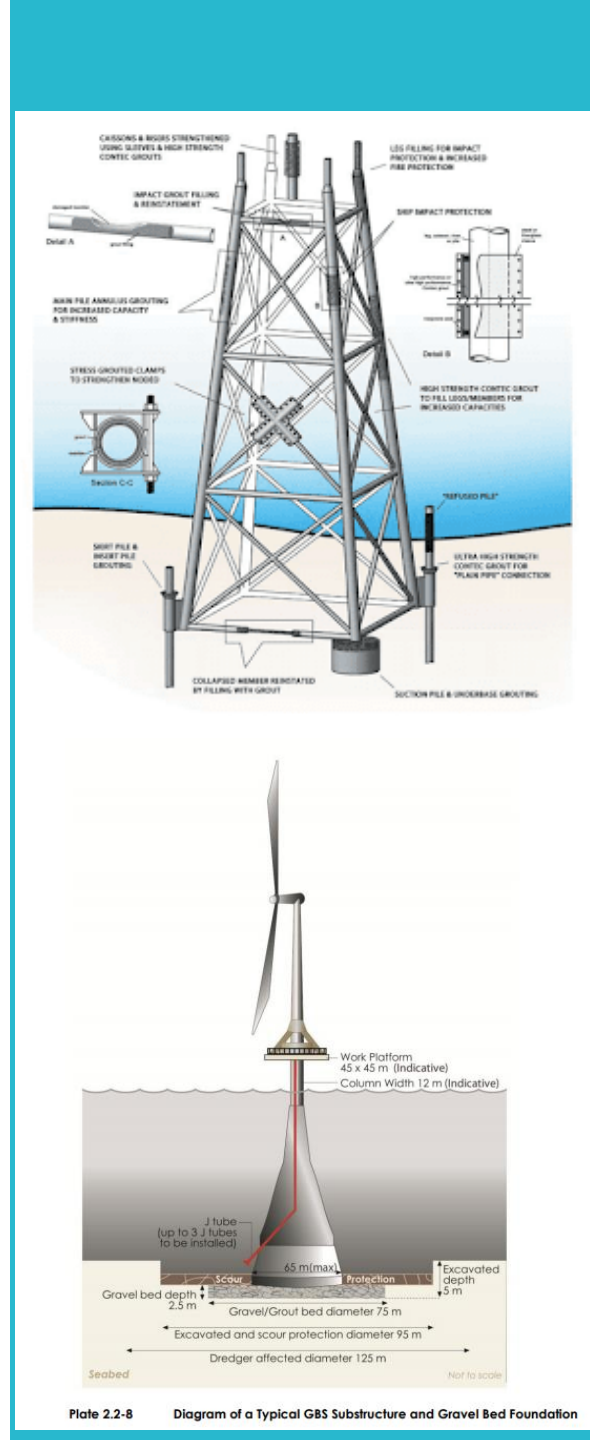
Diagram of a Typical GBS Substructure and Gravel Bed Foundation
